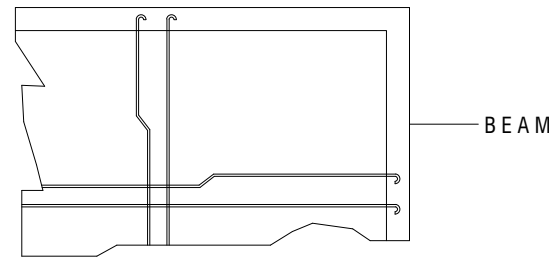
(STANDARD SECTION OF A CONTINUOUS BEAM)
